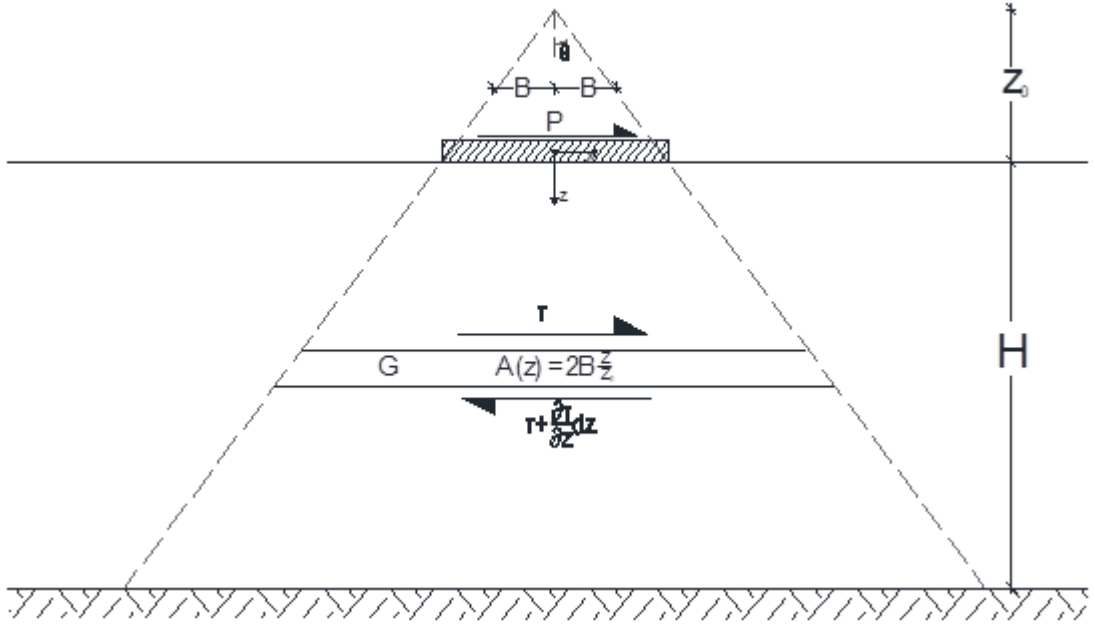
Strip footing subjected to horizontal loading resting on homogeneous soil layer
